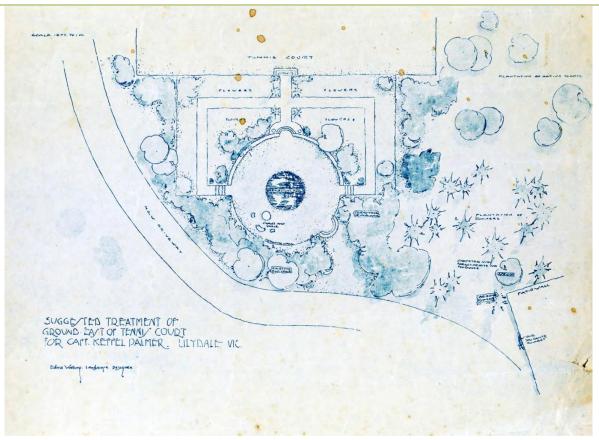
Proposed garden plan in between the tennis court and main house. Source: Walling, E. n.d. *Suggested treatment of ground east of tennis court for Capt. Keppel Palmer, Lilydale VIC*. Landscape architecture drawings. Edna Walling collection: Garden plans. Accession No.: H97.270/104. State Library of Victoria. <u>https://viewer.slv.vic.gov.au/?entity=IE638673&mode=browse</u>.
